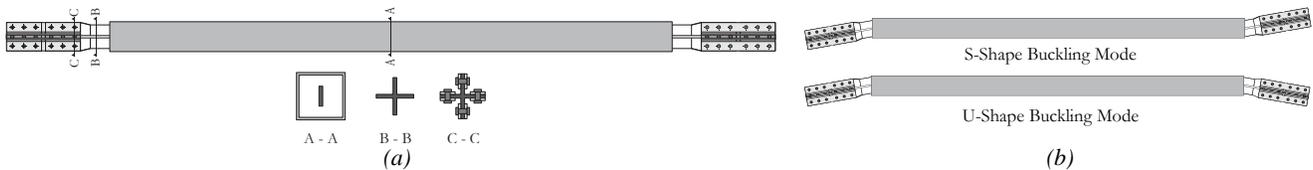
(a) Typical BRB Detail, and (b) BRB Buckling Failure Modes
